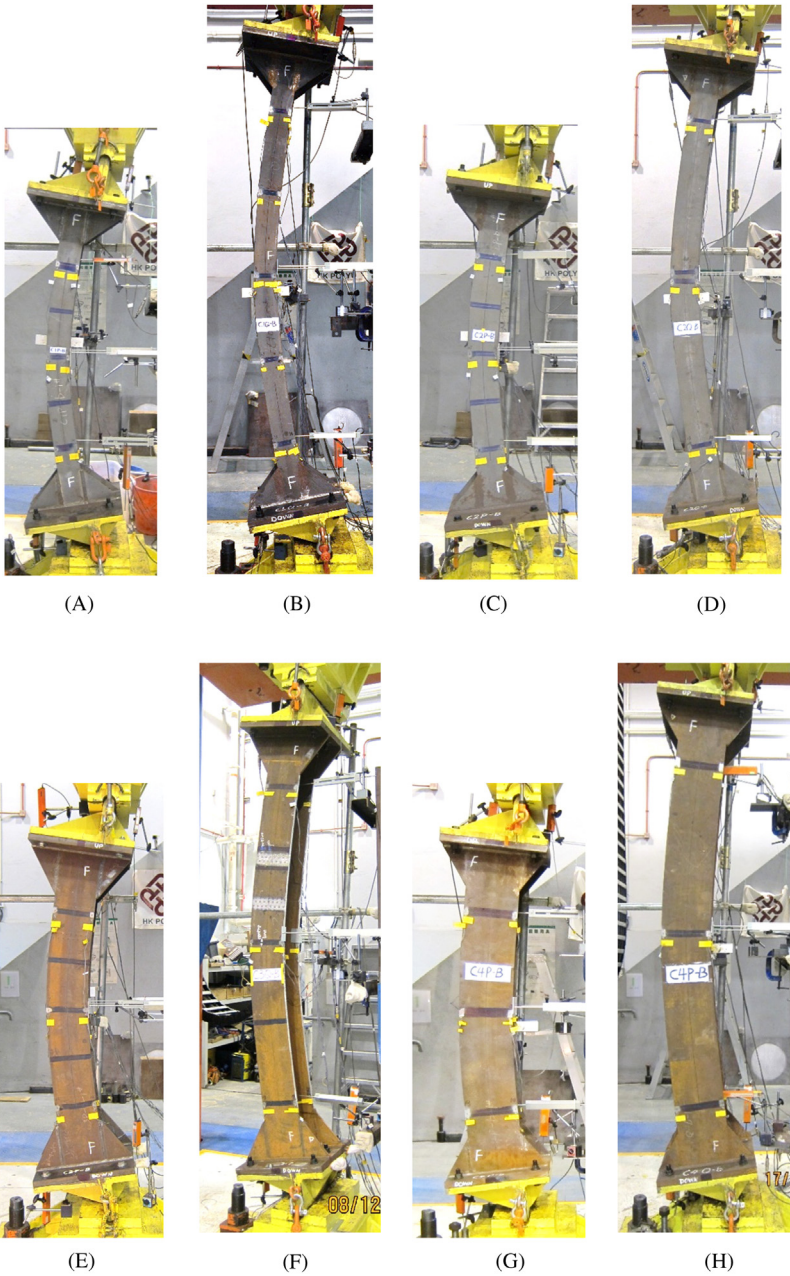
Overall flexural buckling of welded H-sections under eccentric loads: (A) test EH1P, (B) test EH1Q, (C) test EH2P, (D) test EH2Q, (E) test EH3P, (F) test EH3Q, (G) test EH4P, and (H) test EH4Q.
